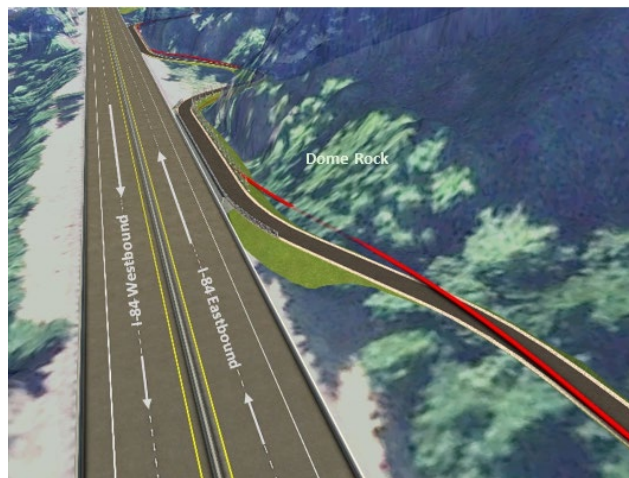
Trail Refinement at Dome Rock (STA 324+00) with alternative alignment consider shown in red.
